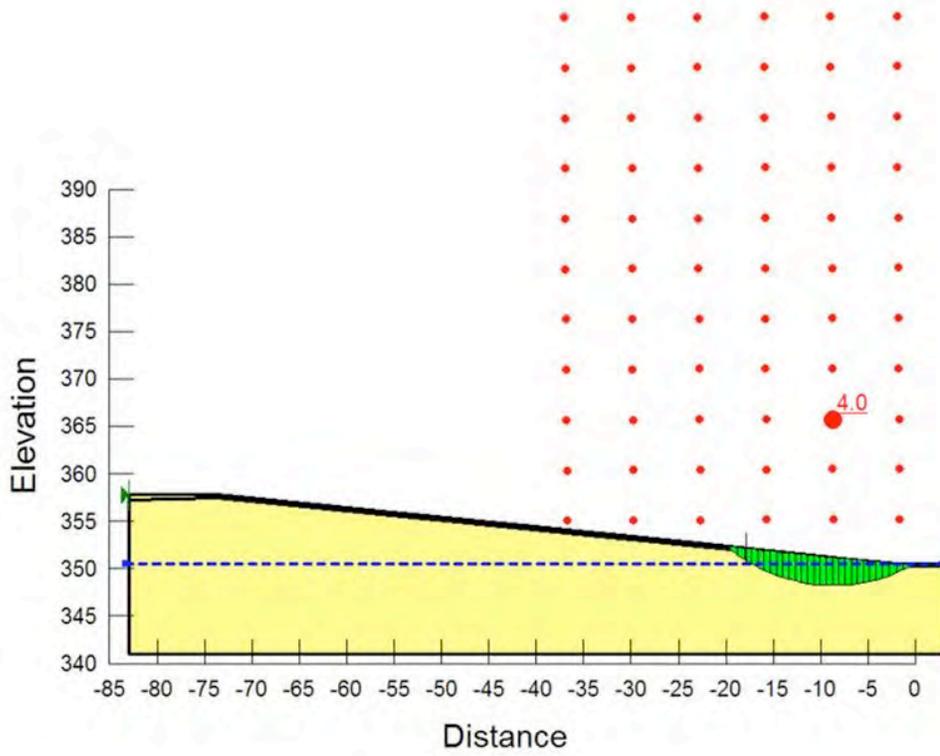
Slope stability model with phreatic surface at channel bottom (FoS=4.0).
